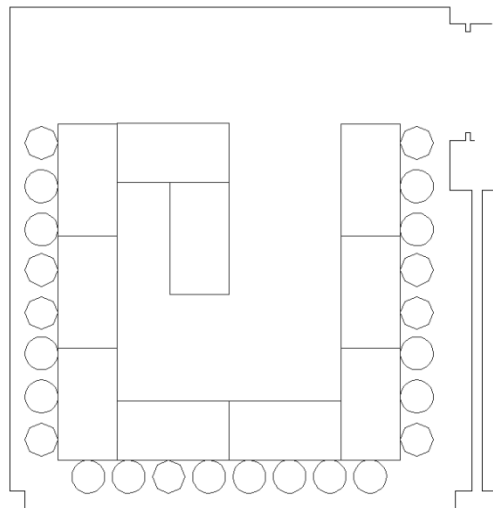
Floor plan of UCL seminar room in AutoCAD format.
